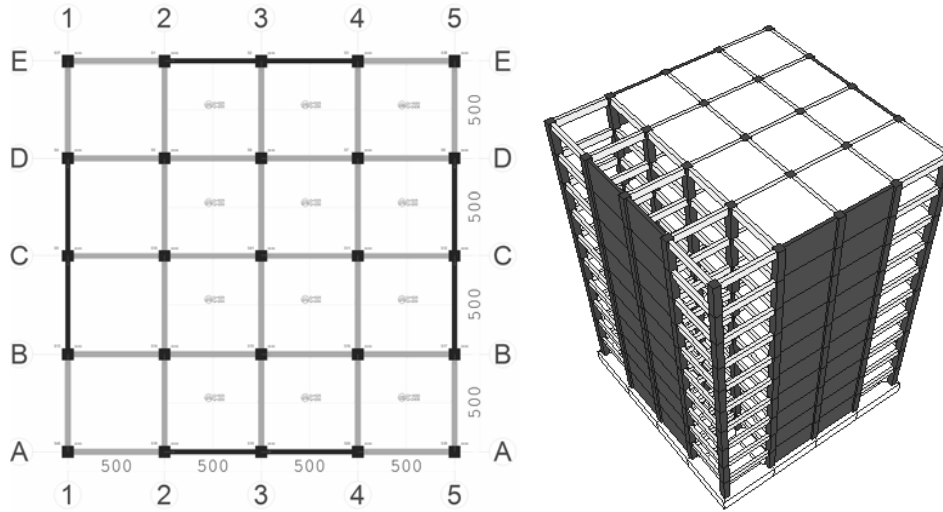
Structural plan and 3D view of parametric model IIIh
